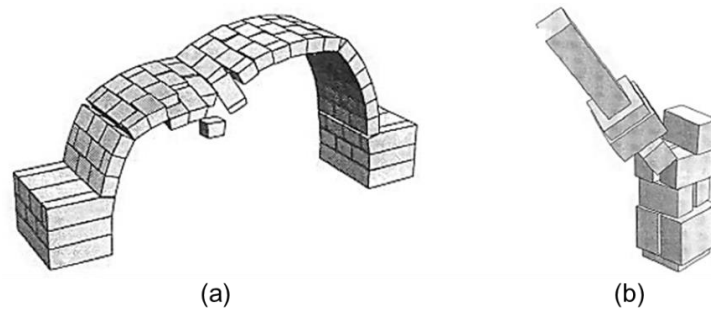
Examples of application of the Discrete Element Method (DEM) to analyze: (a) masonry arch bridge (Lemos, 1995); (b) dry stone masonry pedestal sustaining a statue (Sinclair, 2001).
